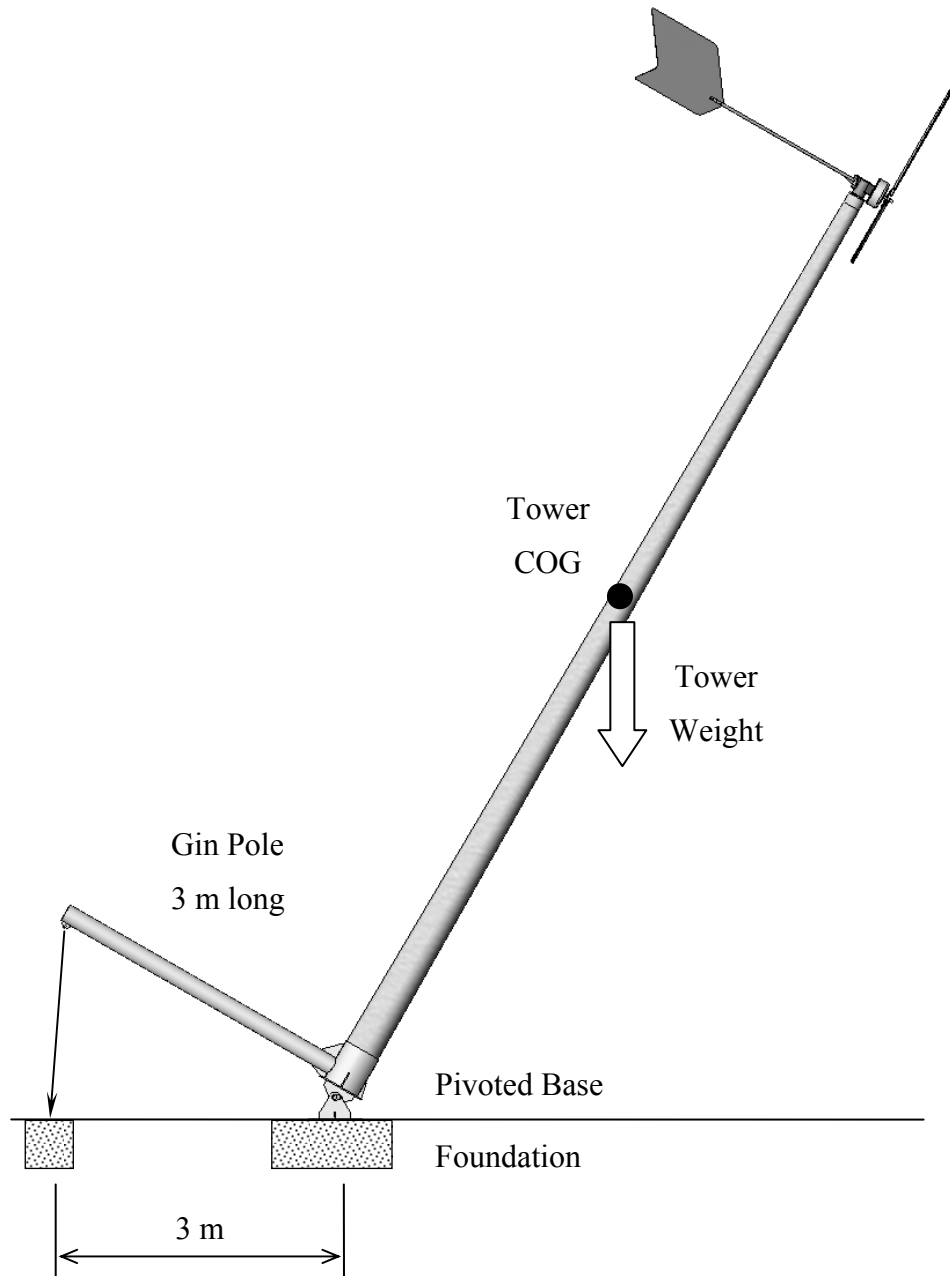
Raising/Lowering of Tower (author's original image 2008)
